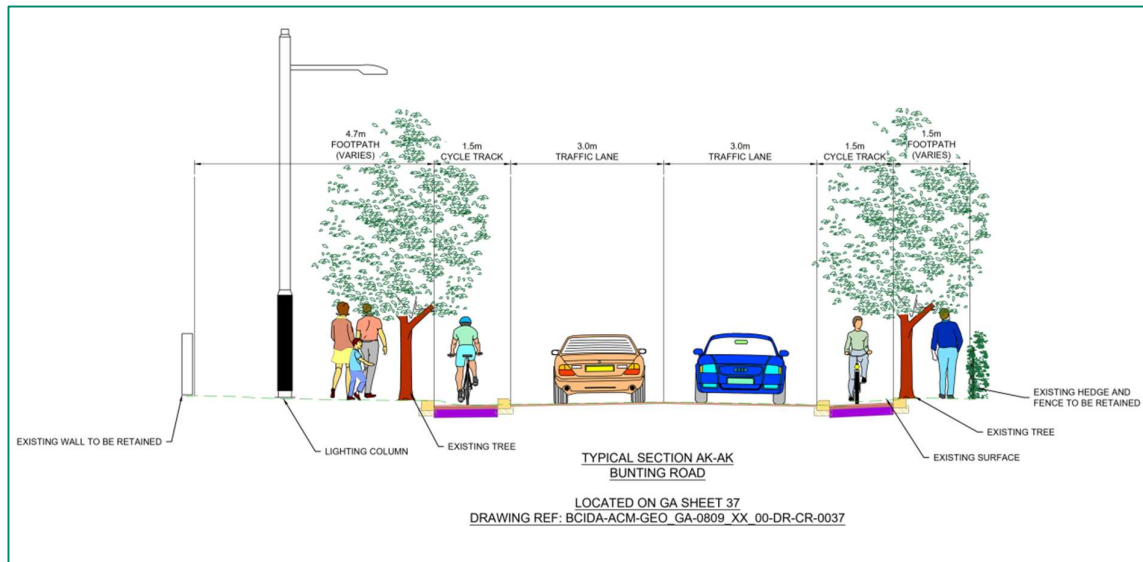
Typical Cross Section AK-AK on Bunting Road
